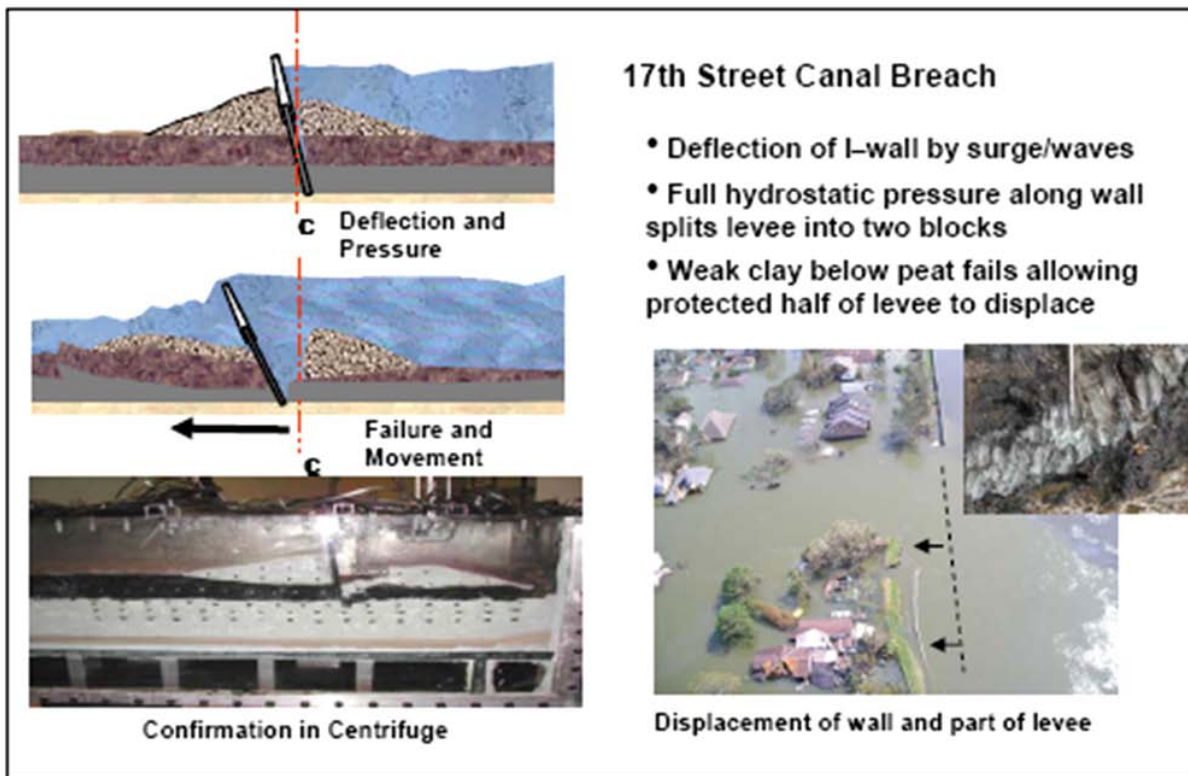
Depiction of failure mechanism for 17th Street and IHNC foundation failures. A crack forming along the front of the I-wall introduced high forces down the face of the sheet pile, resulting in lateral movement of the floodwall along a shear plane in the weak clay foundation.
